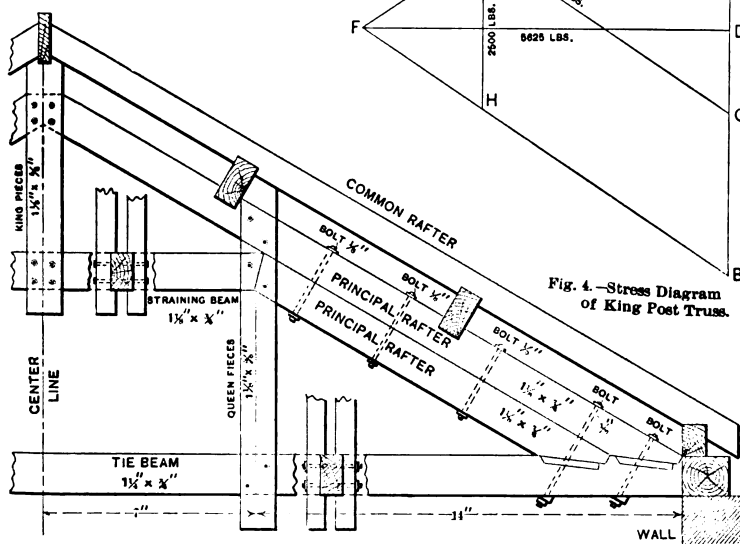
Queen Post Truss.—Scale, 3-16 Inch to the Inch.
